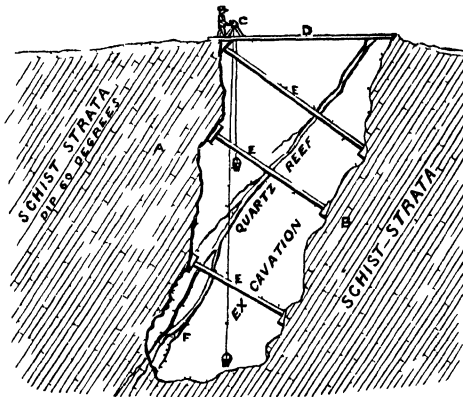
Illustration of the Hanging Wall or Sod, and the Floor or Foot Wall
